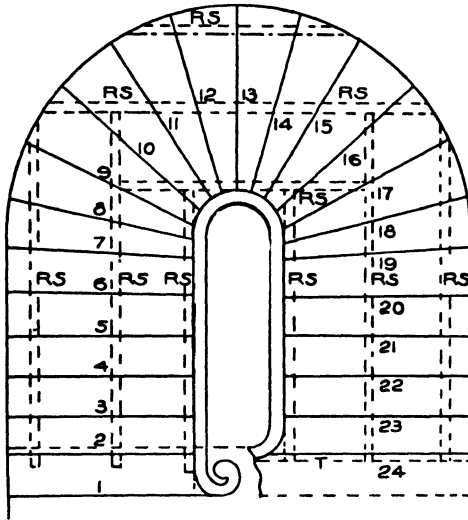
Plan Showing One Method of Constructing Carriage and Trimming Winding Stair
